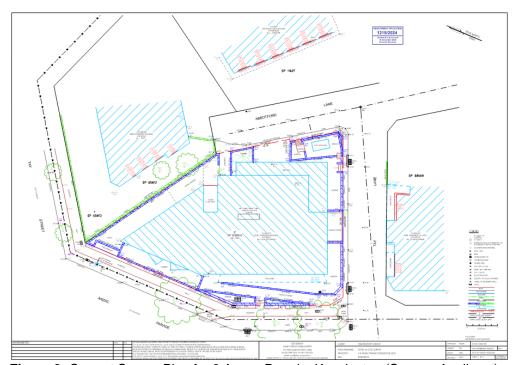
Current Survey Plan for 2 Anzac Parade, Kensington (Source: Applicant)
